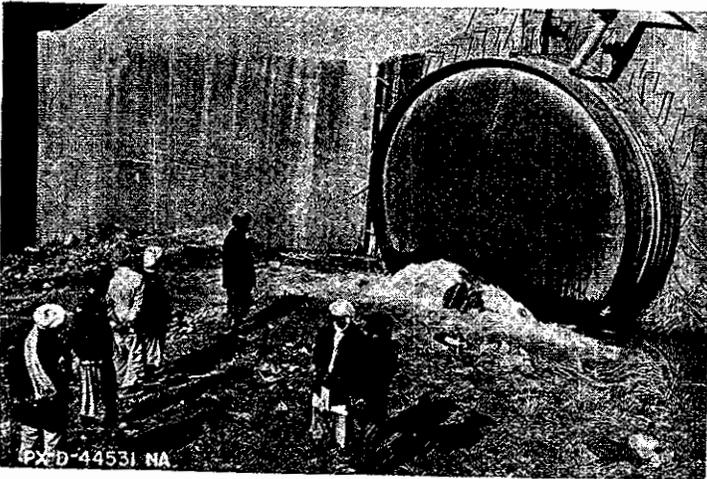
Arghandab Dam penstock bulkhead. Draining the tunnel through a 16-inch-diameter manhole cover.
